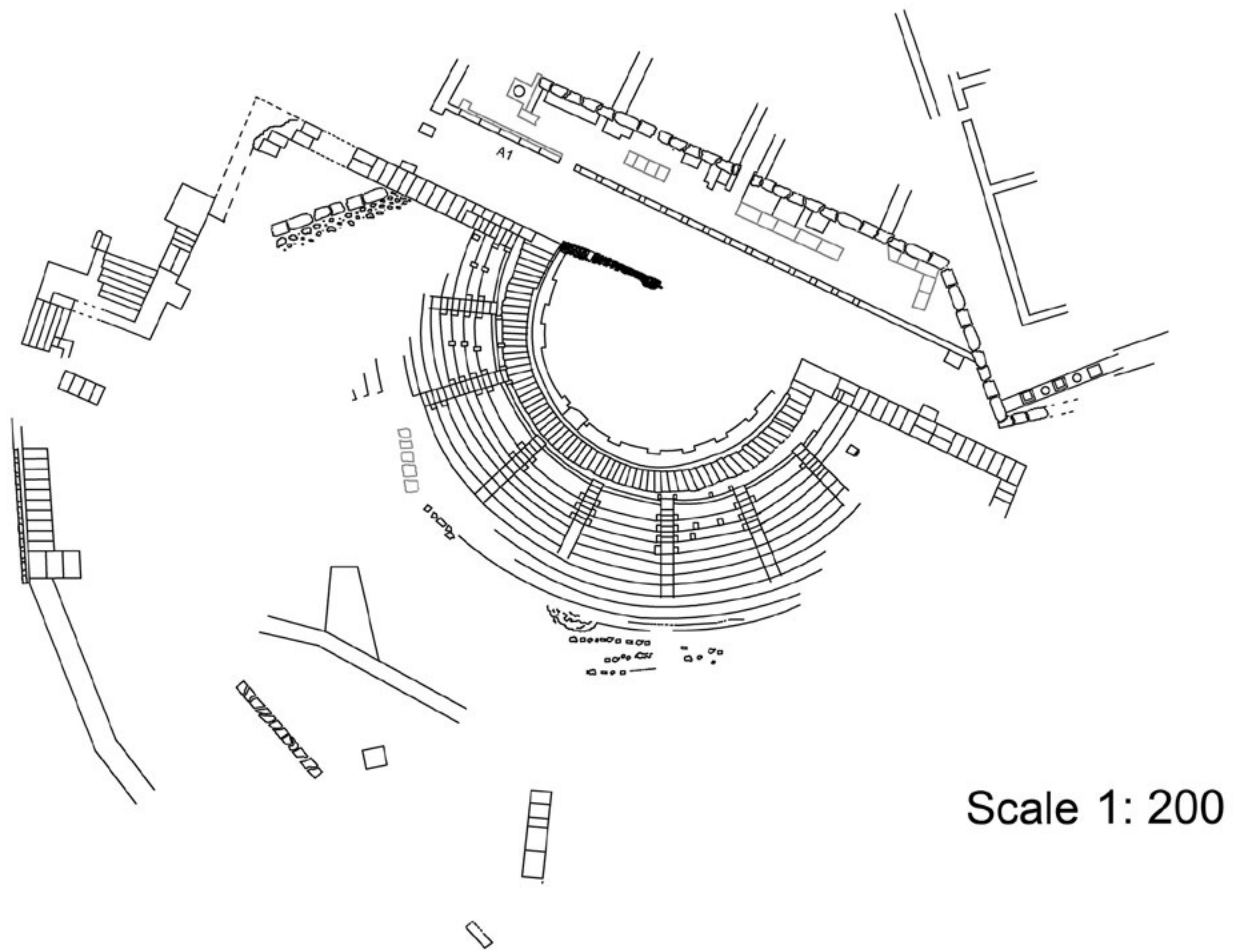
Orchomenos. Plan of the theatre (drawing: M. Germani 2018).
